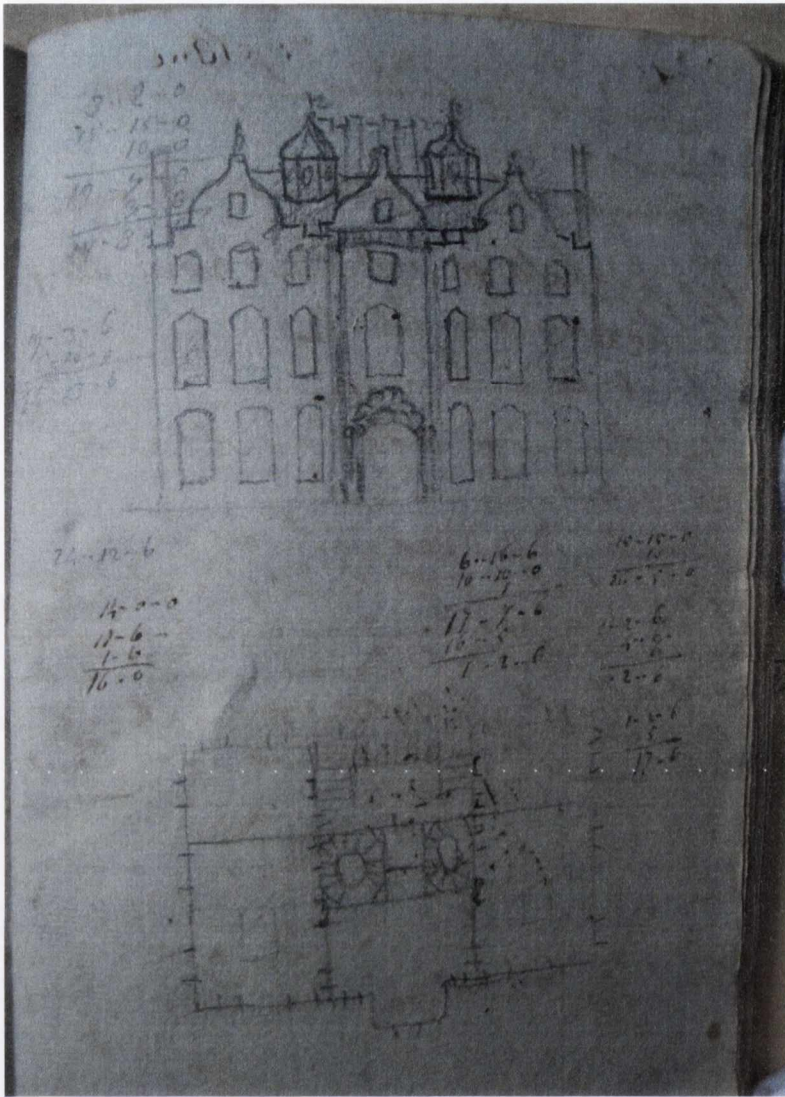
Elevation and plan of a building, Laurence Parsons, 1786, Tour journal, f. 44v.
